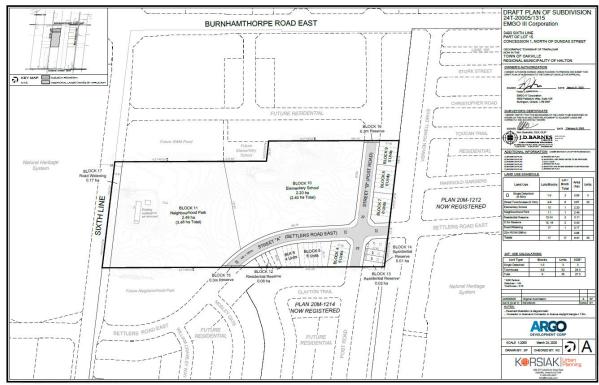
Proposed Draft Plan of Subdivision (also provided in Appendix B)
